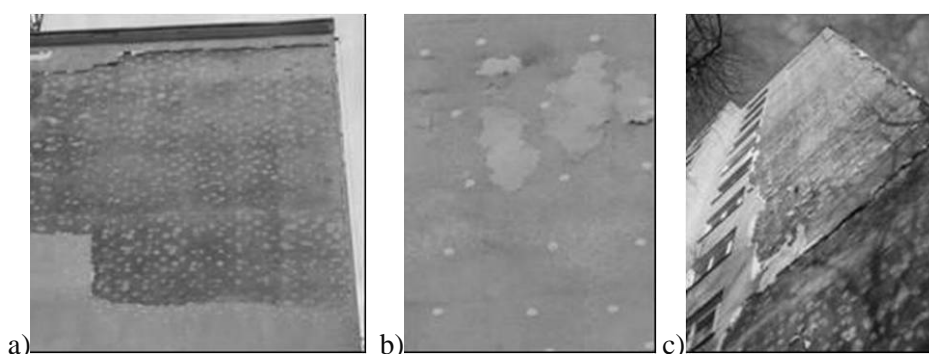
Effects of faulty insulation of two 11-storey buildings - view following the separation of the insulation layer: a) at the level of the top three floors, b) secondary dowelling of the remaining insulation, c) along the entire height of the building
